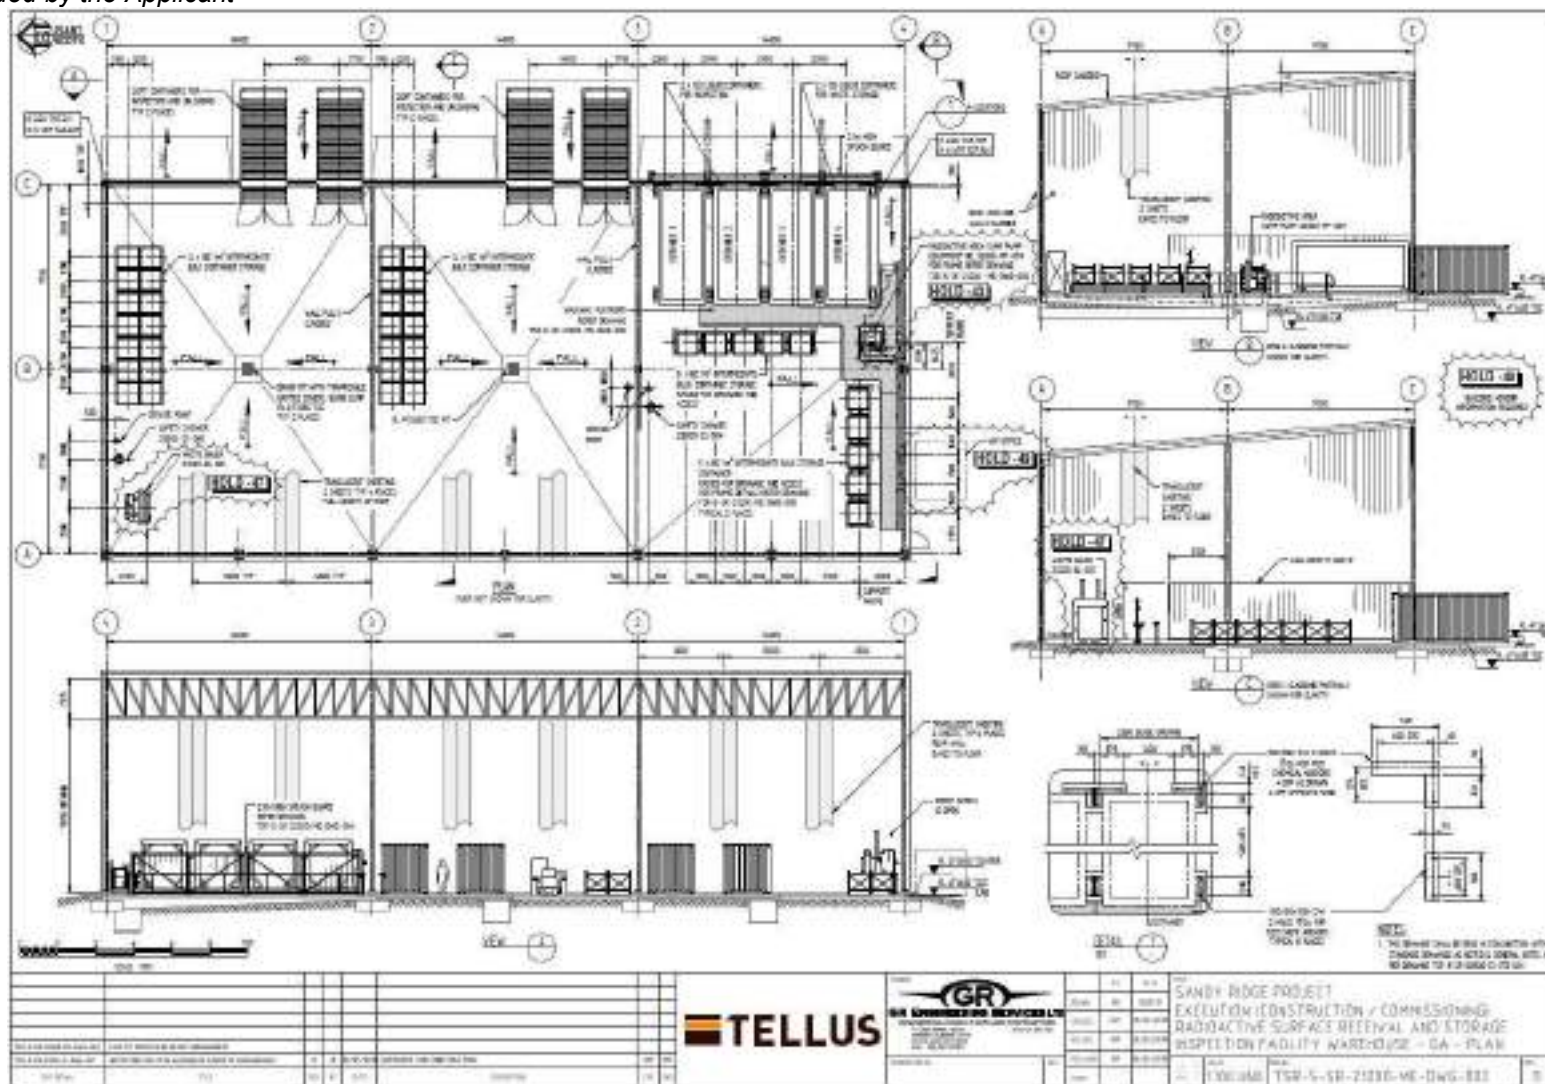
Construction detail – Radioactive and Liquid Waste Inspection Warehouse
